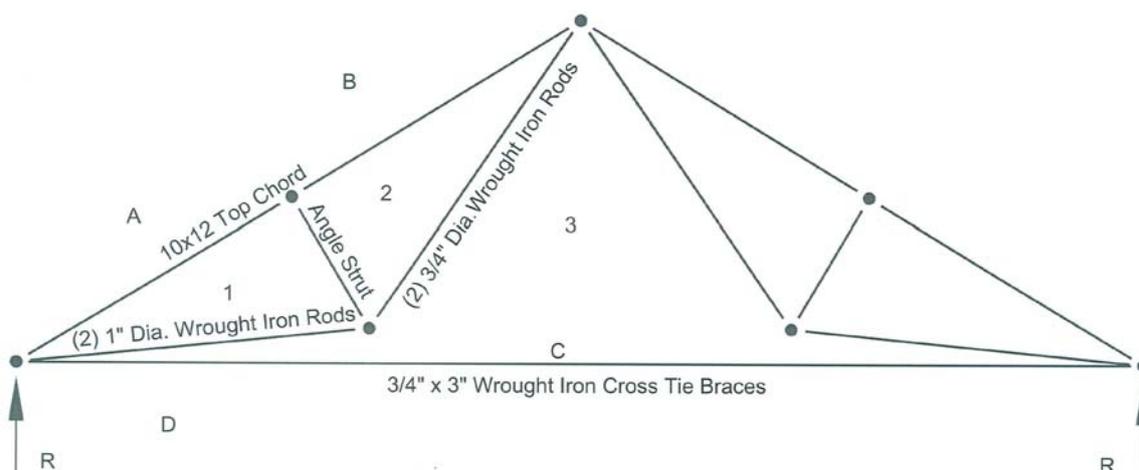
Testing and analysis indicates that the roof system acts as an A-frame with trussed rafters.
